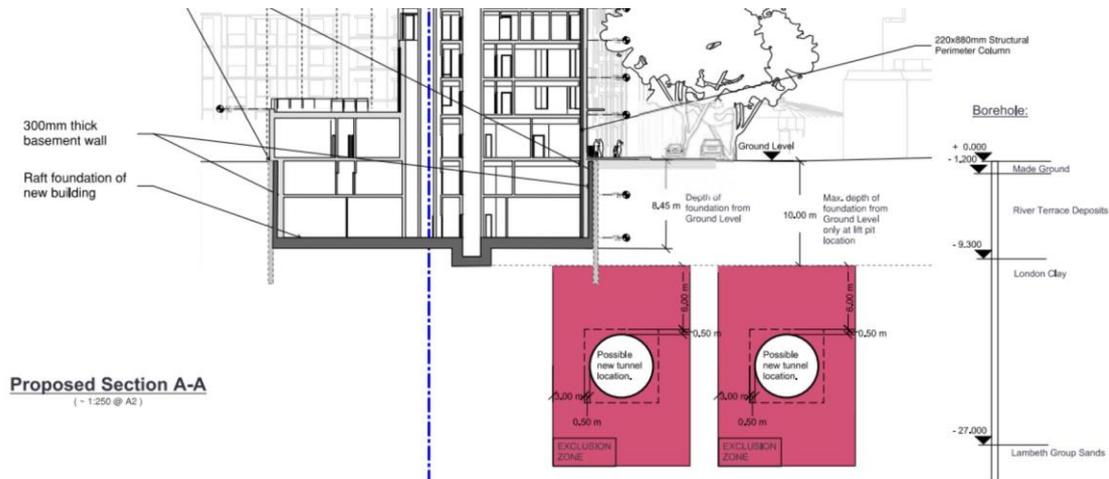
(above): Cross-section demonstrating the interaction between the foundations of the proposed development and the BLE safeguarding zone.
